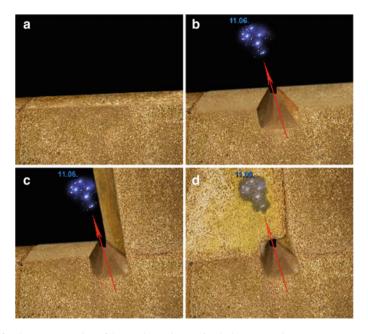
The reconstruction of the southern observation hole construction sequence (reconstructed by Jacek Kościuk)
